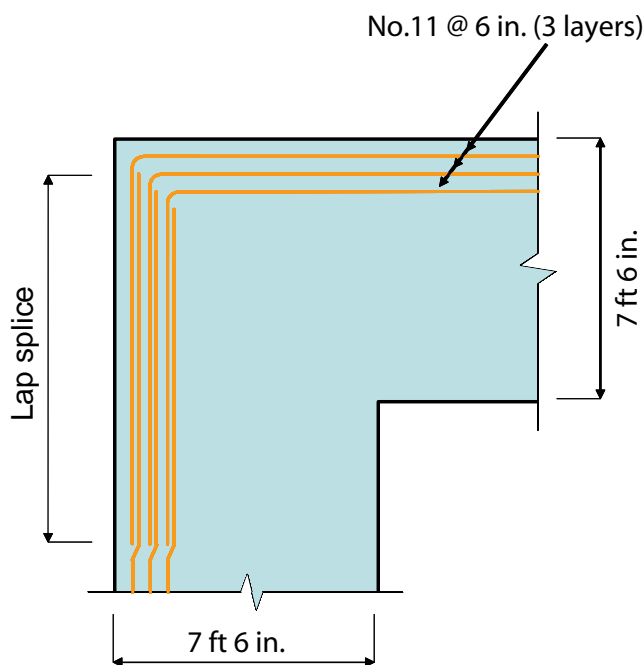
Primary flexural reinforcement adapted from the design of a wall/roof slab junction of a tunnel (note: 1 in. = 25.4 mm; 1 ft = 304.8 mm)
